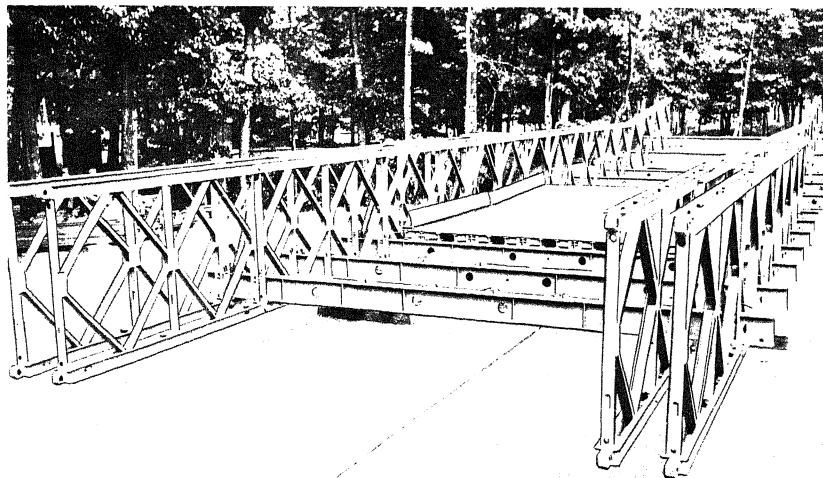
Assembly of remainder of DS bridge—third bay bracing added, second bay bracing tightened
